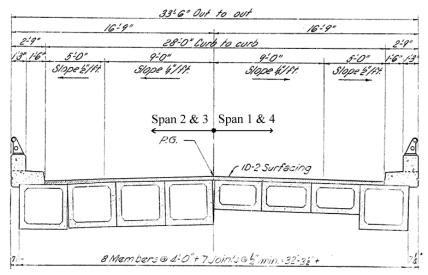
Cross-Section of the Lakeview Drive Bridge
